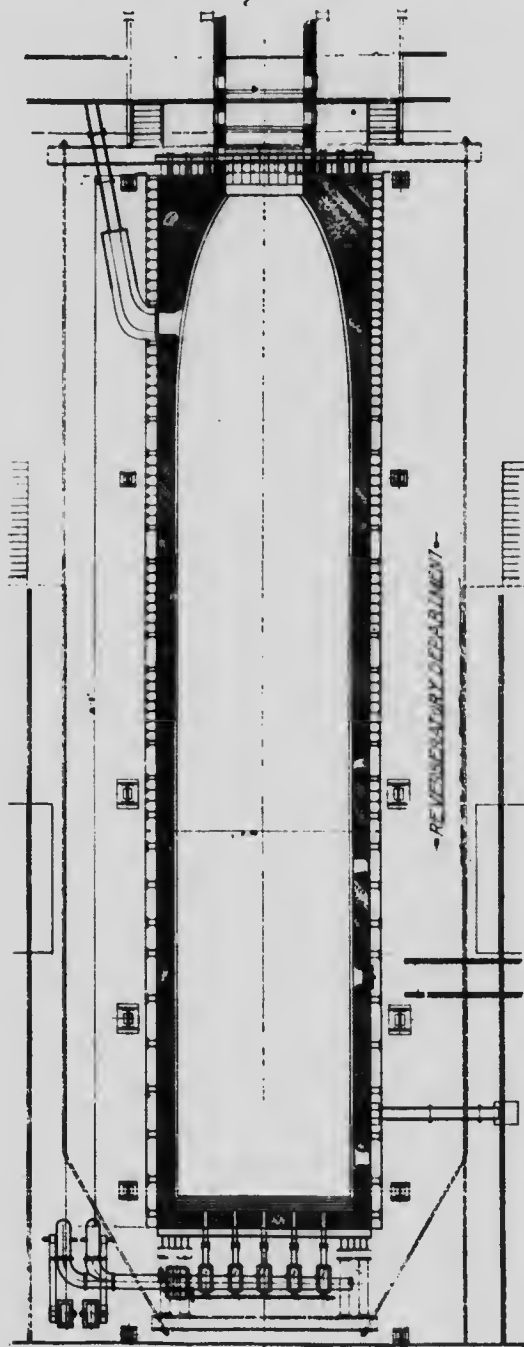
Sectional plan of No. 1 reverberatory furnace.
